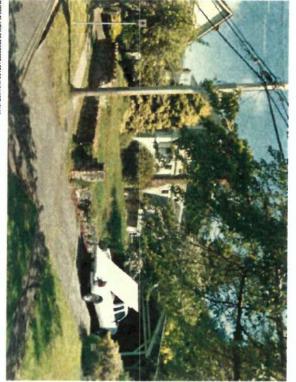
VEW OF PROPOSED LOT LOOKING WORTH EAST FROM MOSS STREET NOTE EXSTING RETAINING WALLS TO BE SALVINGED AND RE VISED DURING CONSTRUCTION
